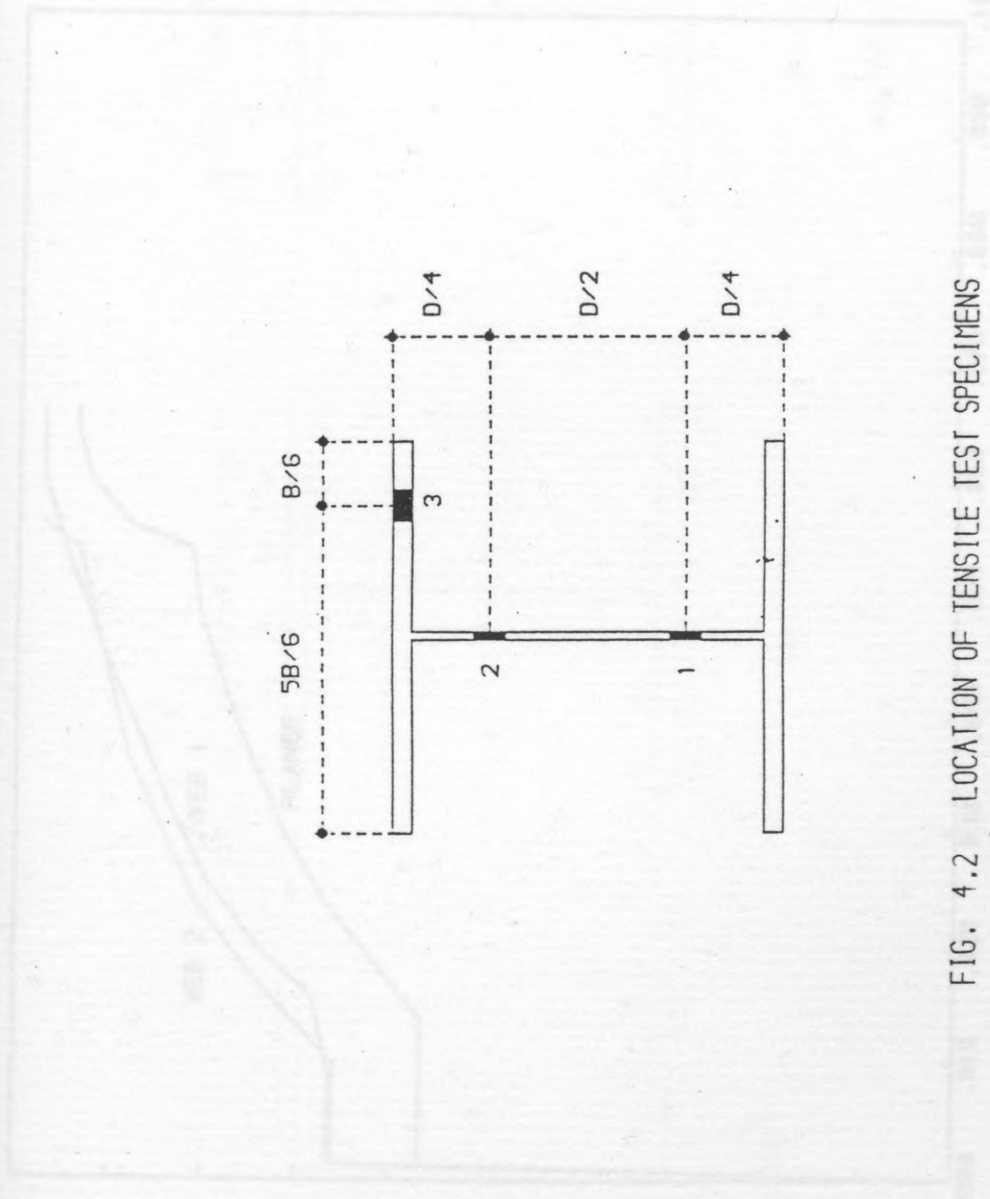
LOCATION OF TENSILE TEST SPECIMENS
